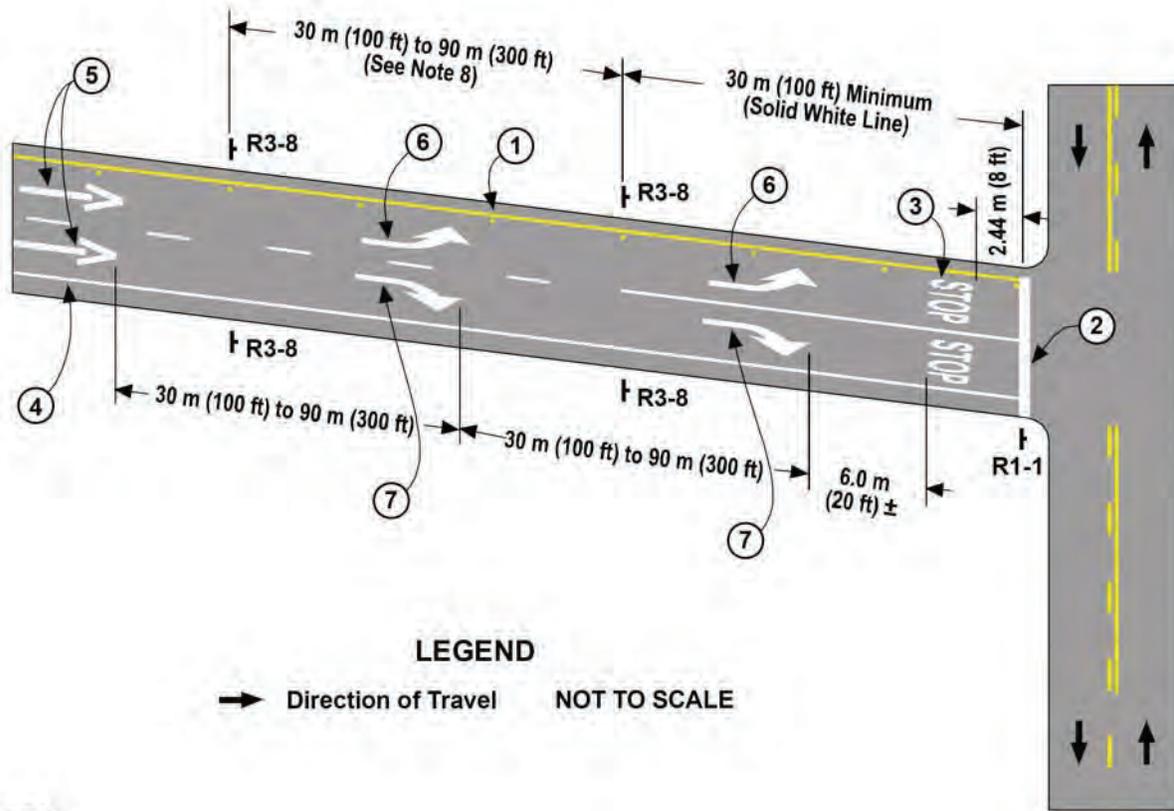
B-23 (CA). Examples of Entrance/Exit Ramp Terminal Signs and Pavement Markings (Sheet 2 of 6)
